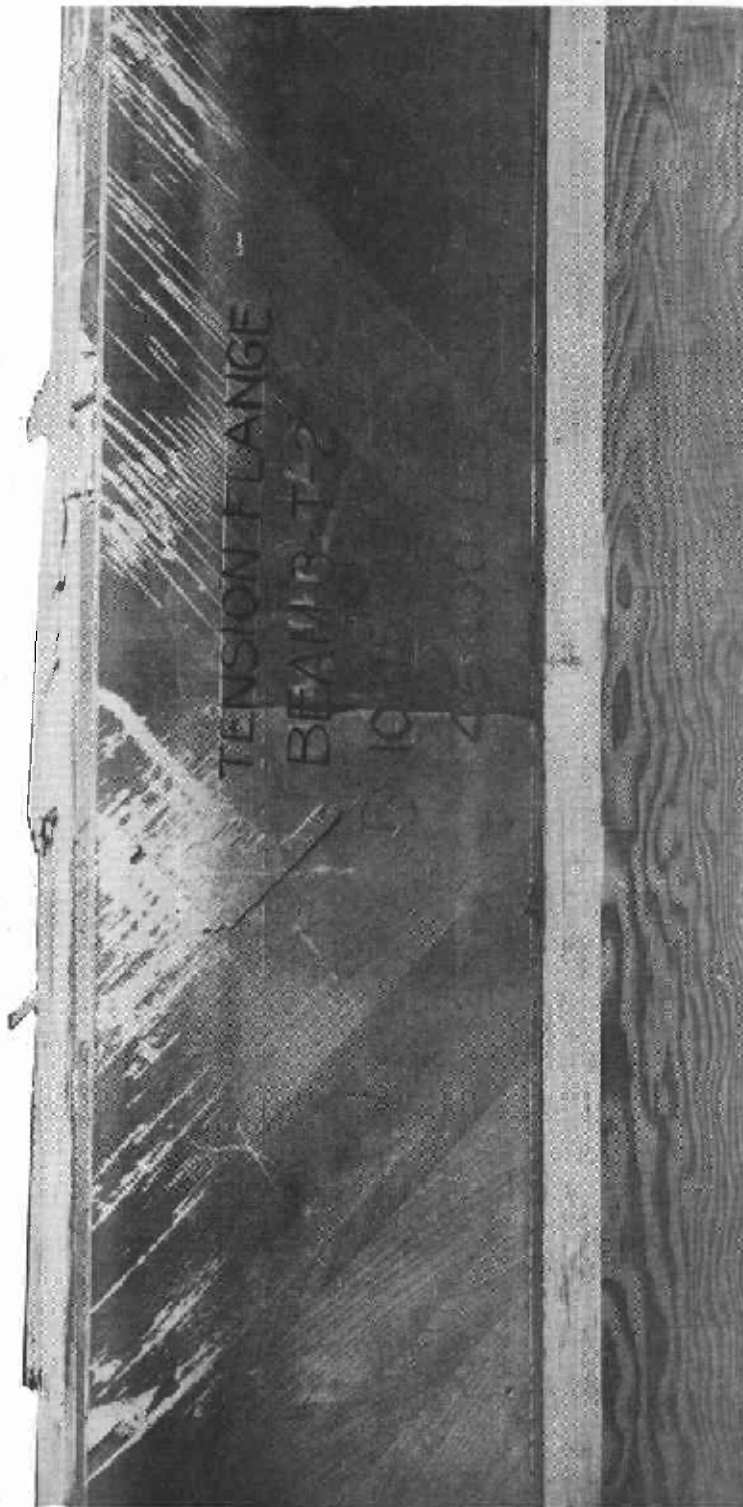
Beam 3-T-1 after failure, showing typical straight-grained tension-flange failure.
